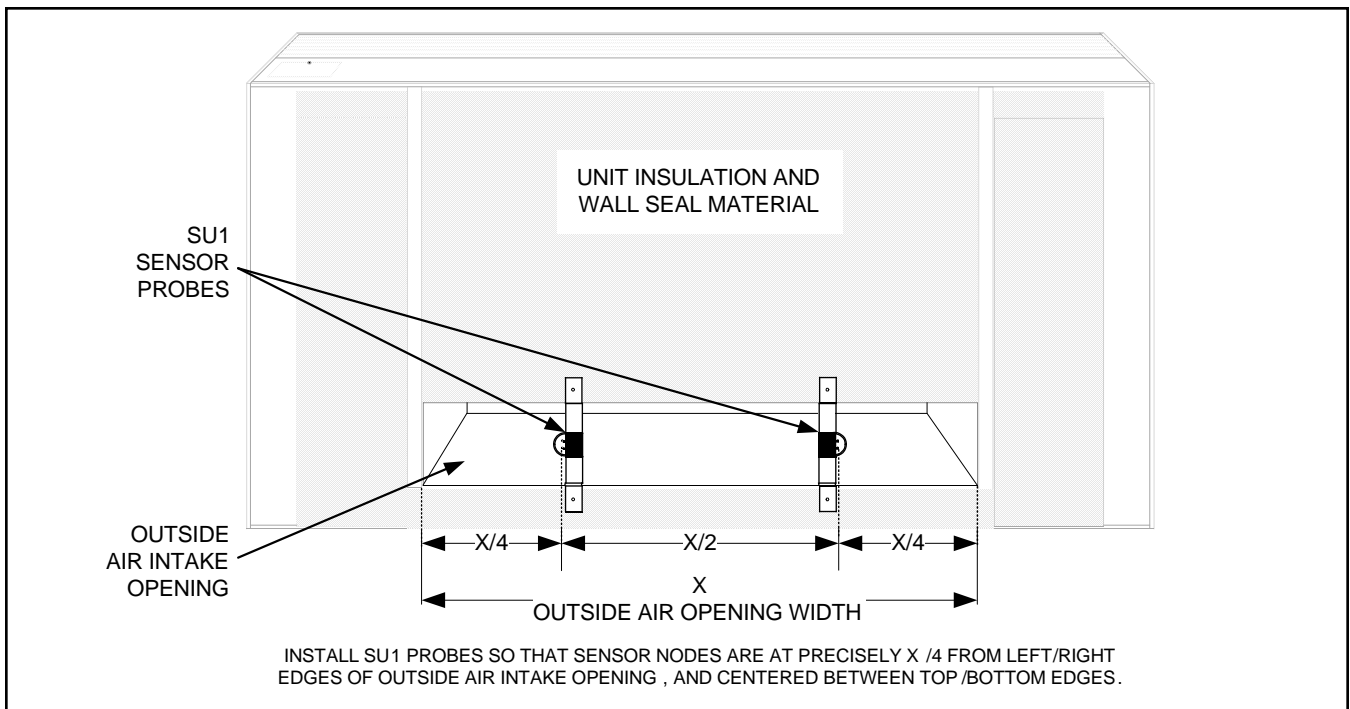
SU1 Sensor Probe Installation and Mounting Detail
